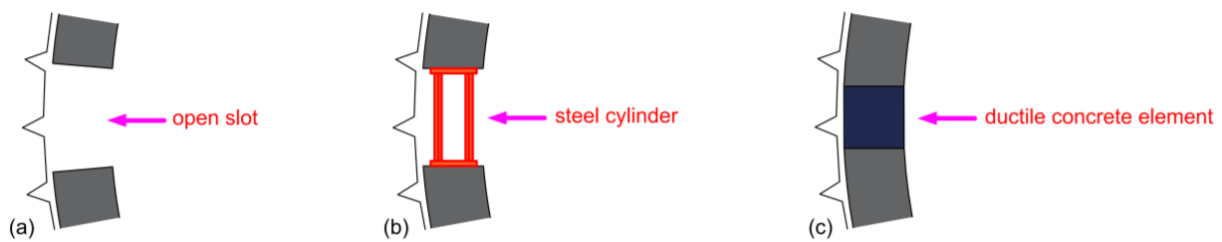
Shotcrete shell with (a) open slots; (b) steel cylinders; and (c) ductile concrete elements.
